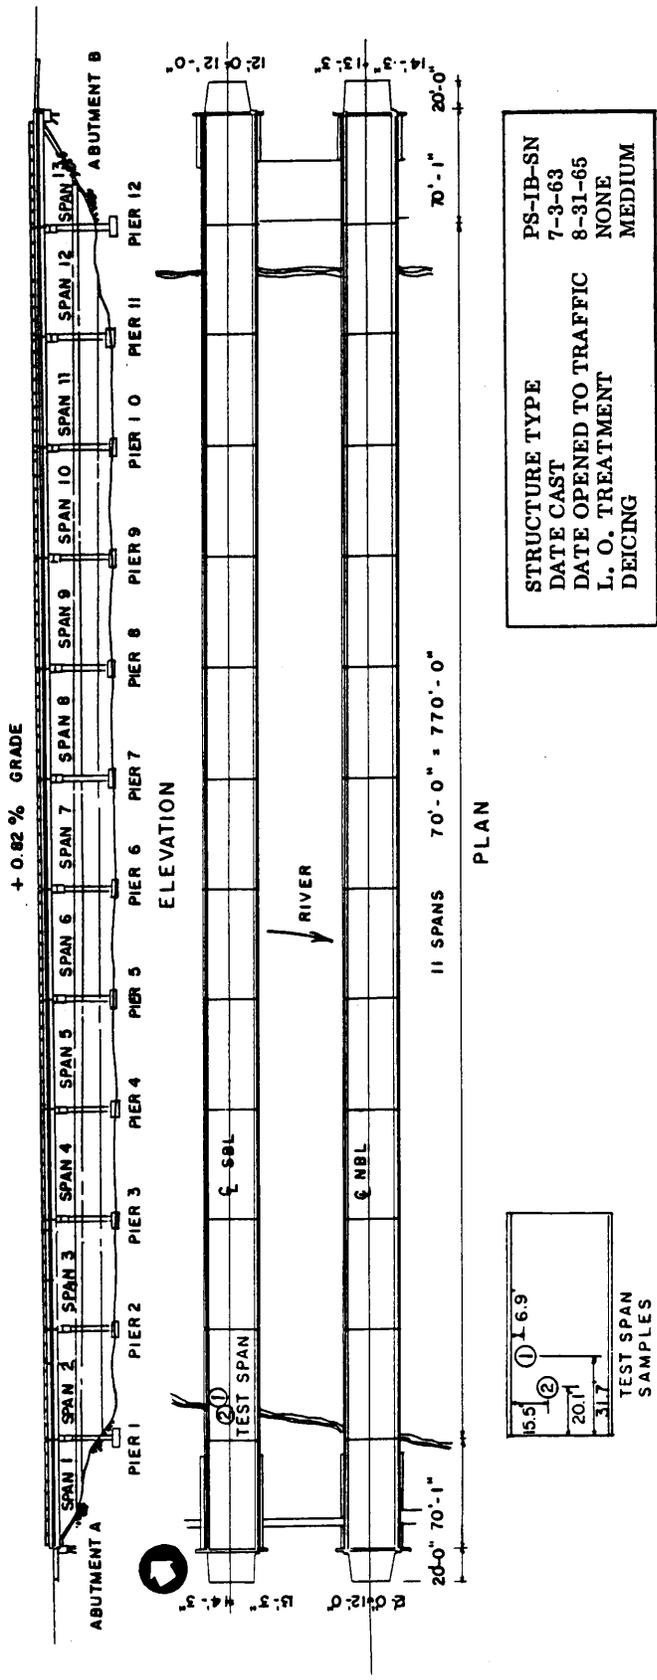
Plan for bridge #9; also shown are the locations of test samples.
